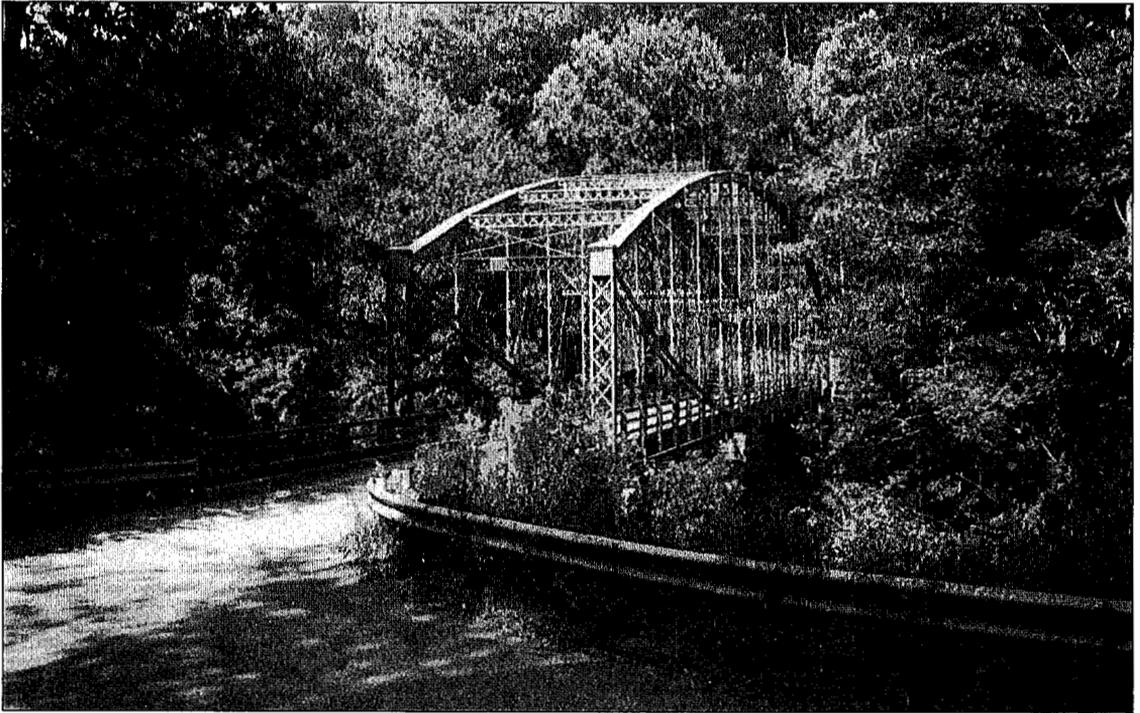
The Bardwell's Ferry Bridge in Shelburne.
